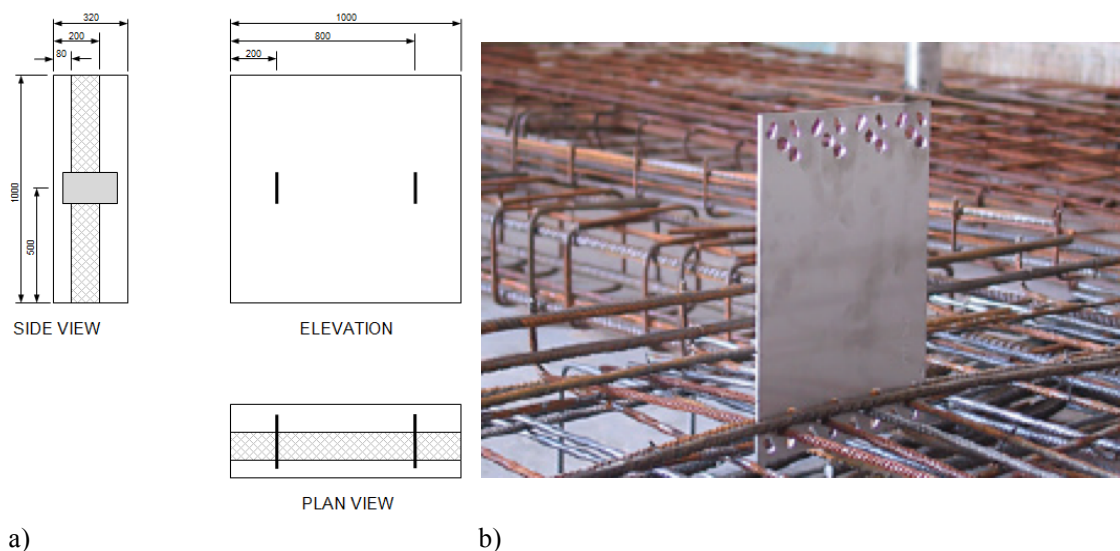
a) precast sandwich panel configuration, and b) example of plate tie used and method of attachment to rebar prior to casting of concrete.
